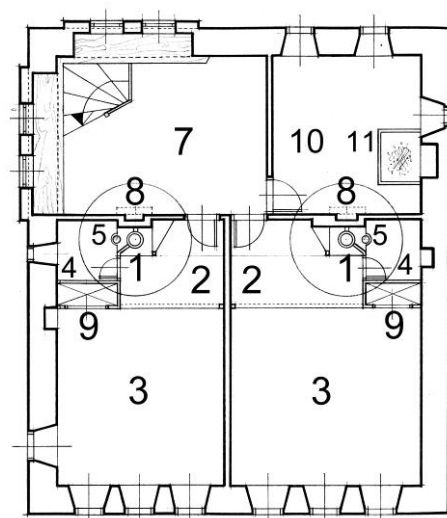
Upper floor layout of the fortified house, [H-“B.D.”], built in Gjakova
